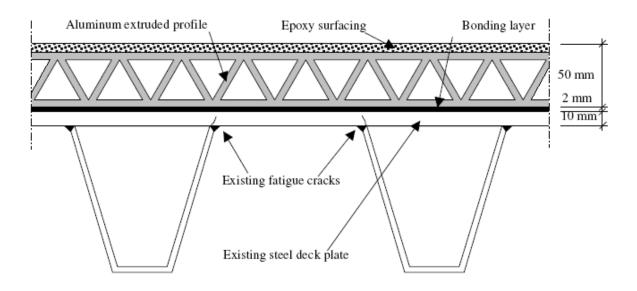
Renovation using extruded aluminium panels with bonded connection
